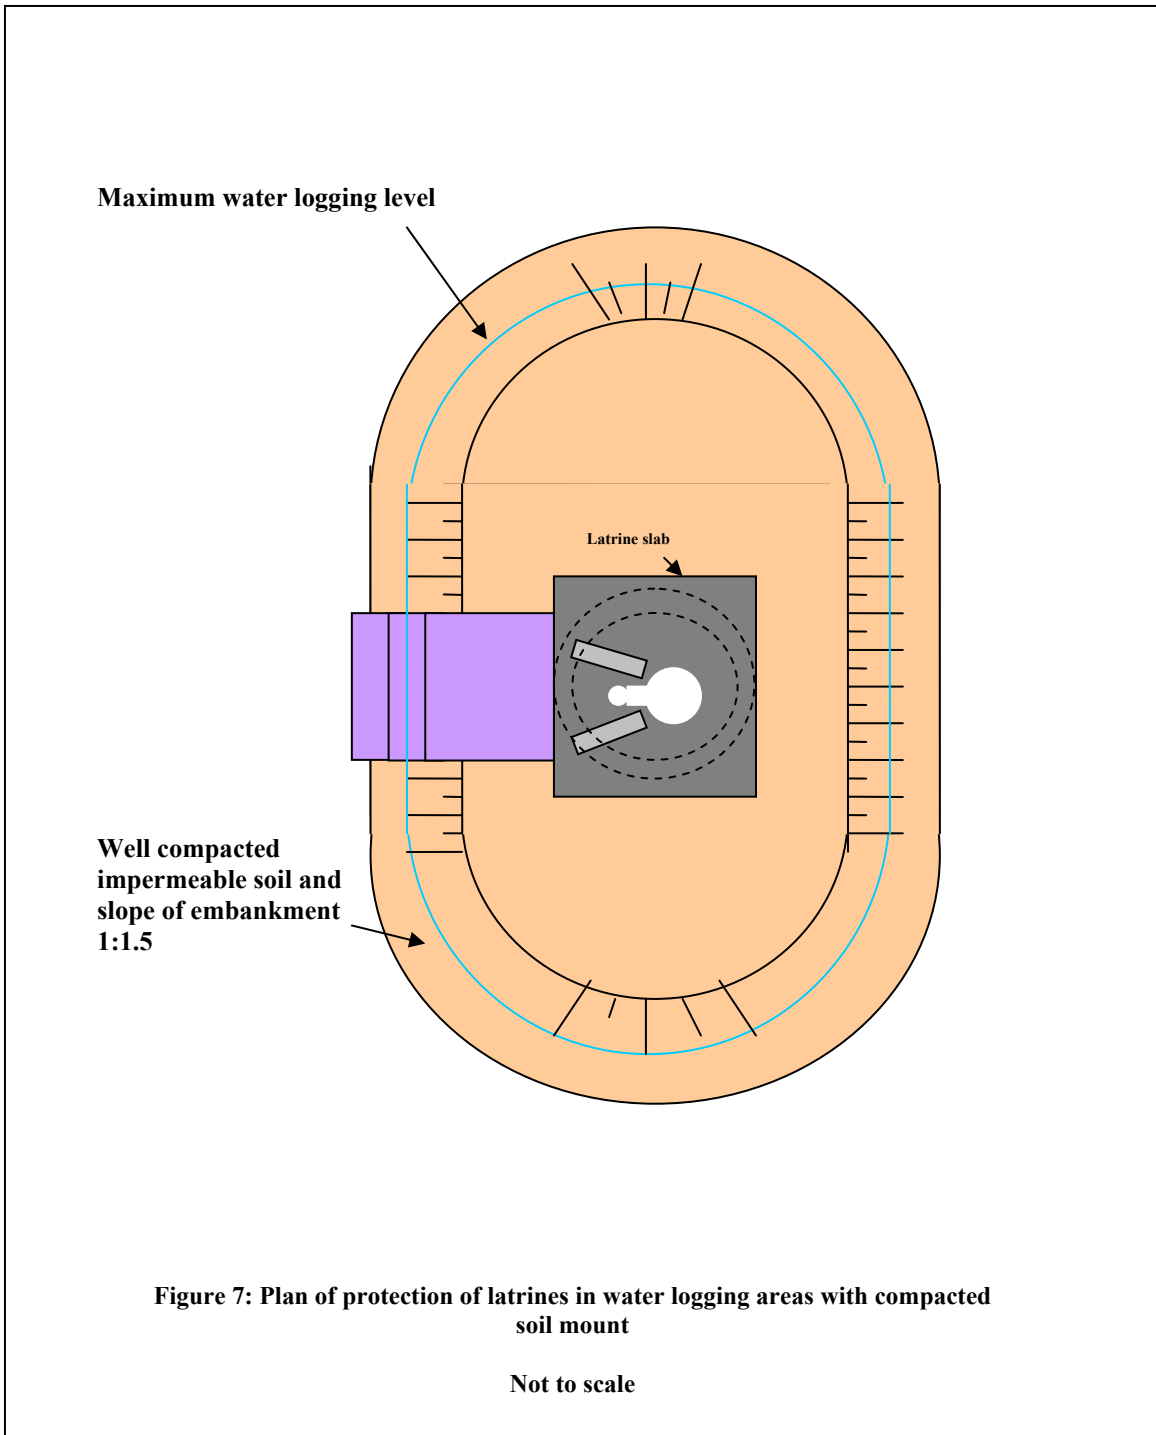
Plan of protection of latrines in water logging areas with compacted soil mount
